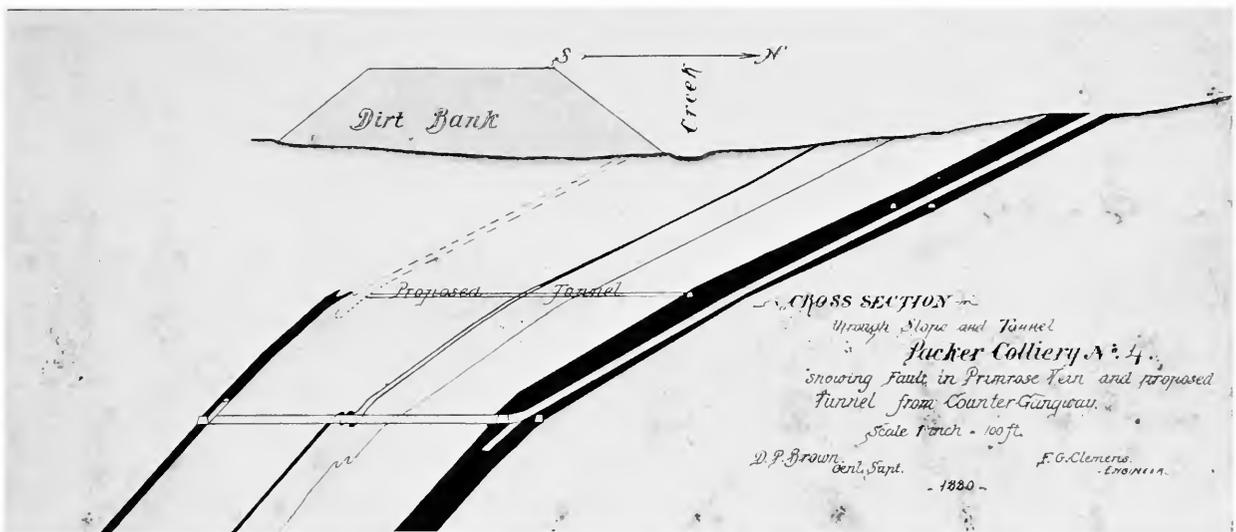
Cross-section through slope and tunnel, Packer No. 4 Colliery, 1880.
